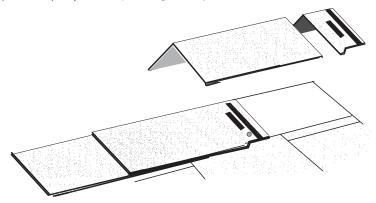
EZ-Ridge® Shingle Cut to Create an End Cap
